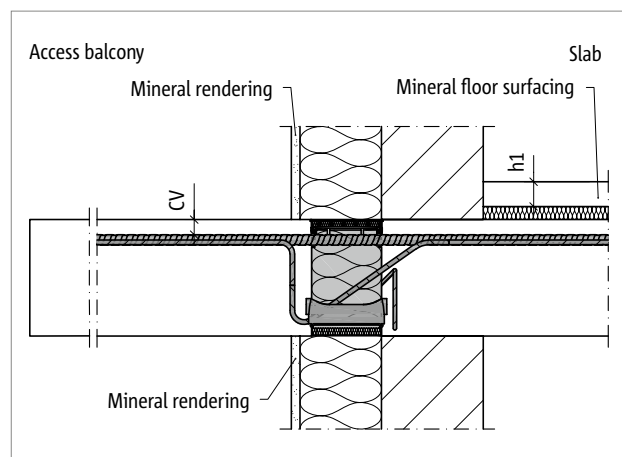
Schöck Isokorb® CXT type K-E-REI120-CV26: Floor with flooring material; fire protection class of the passageway walk up to REI 90
